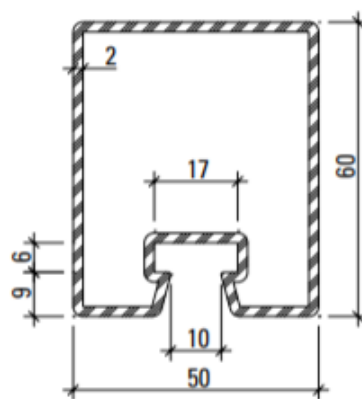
Cross sectional detail of the 76.671 (source: Jansen VISS-Fassade-LP)
